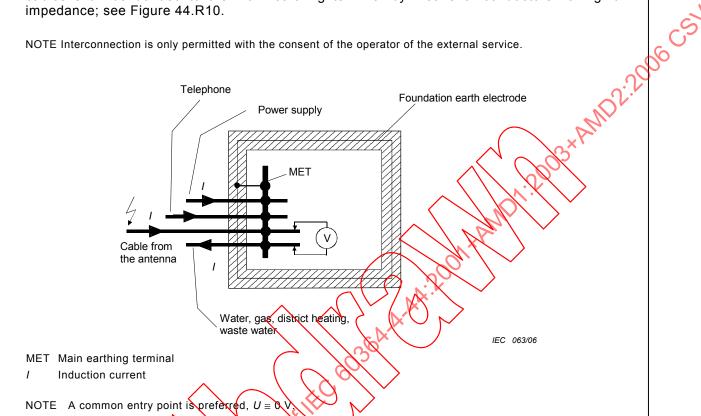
R10 – Armoured cables and metal pipes entering the buildings (examples)
